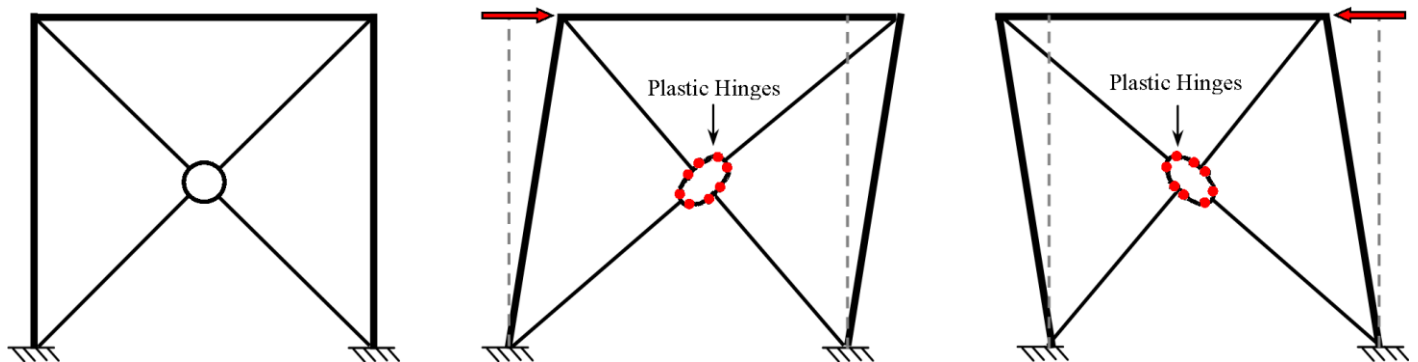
Concept of adding steel ring connection (SRC) to a typical single-storey braced frame and its deformation mechanism due to lateral load.
